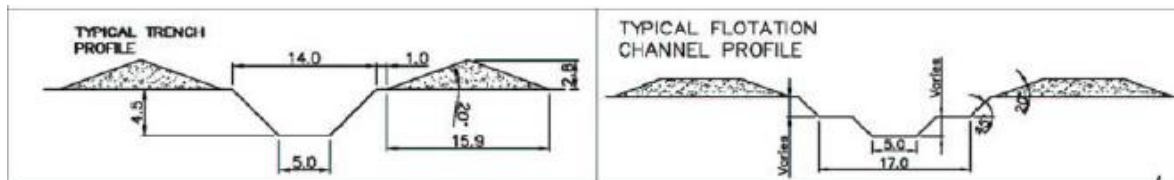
Type of pre-trench "Floatation trench" or "Pipe trench"
